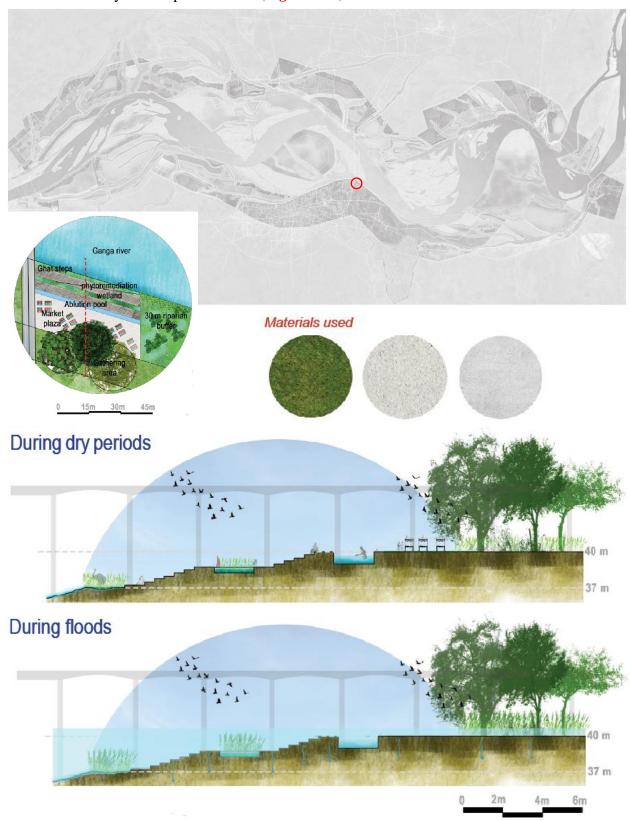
Detail plan of Barari Ghat with profile sections showing how the design is flood resilient through use of permeable materials and wetlands proposed. (Source – Author)
